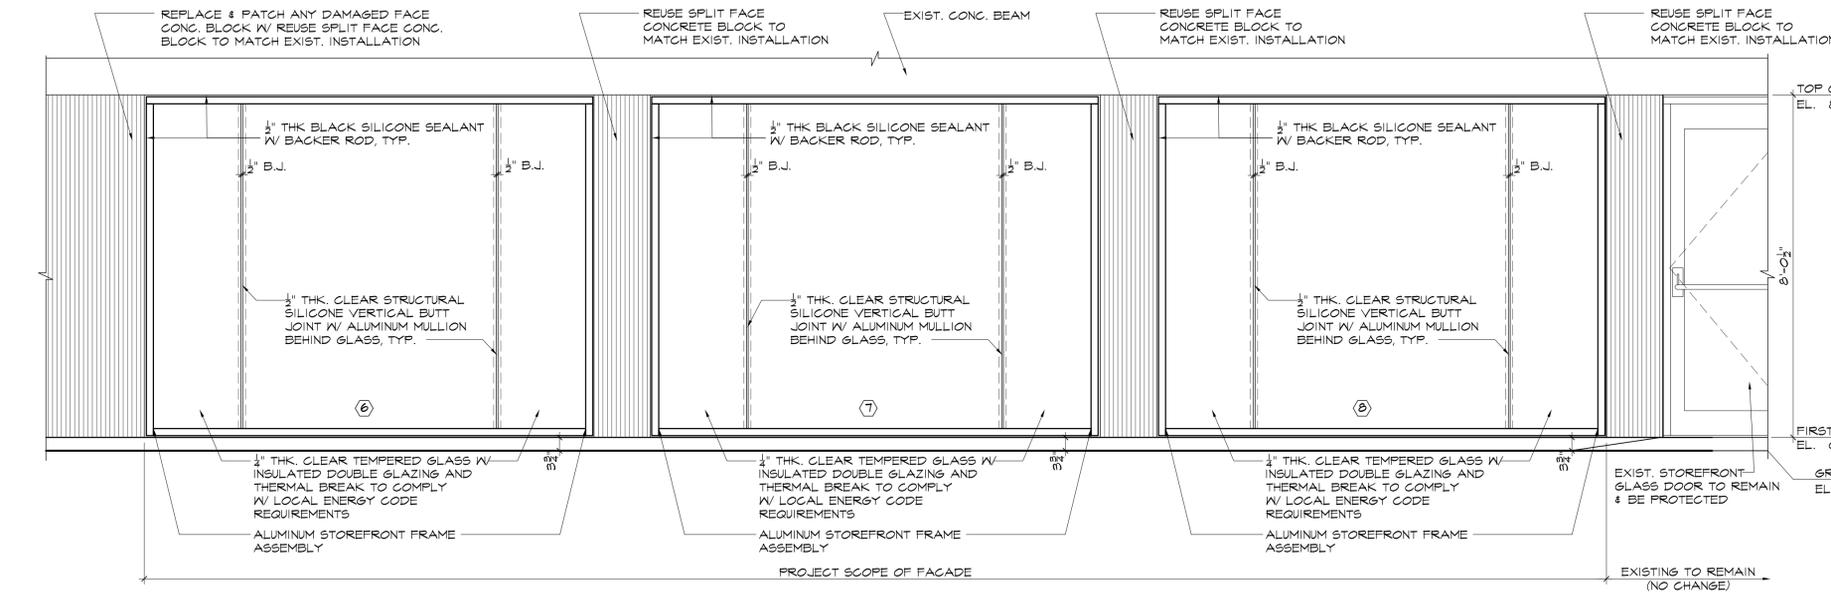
DETAIL ELEVATION STOREFRONT ATTACHMENT SCALE: 1-1/2" = 1'-0"
